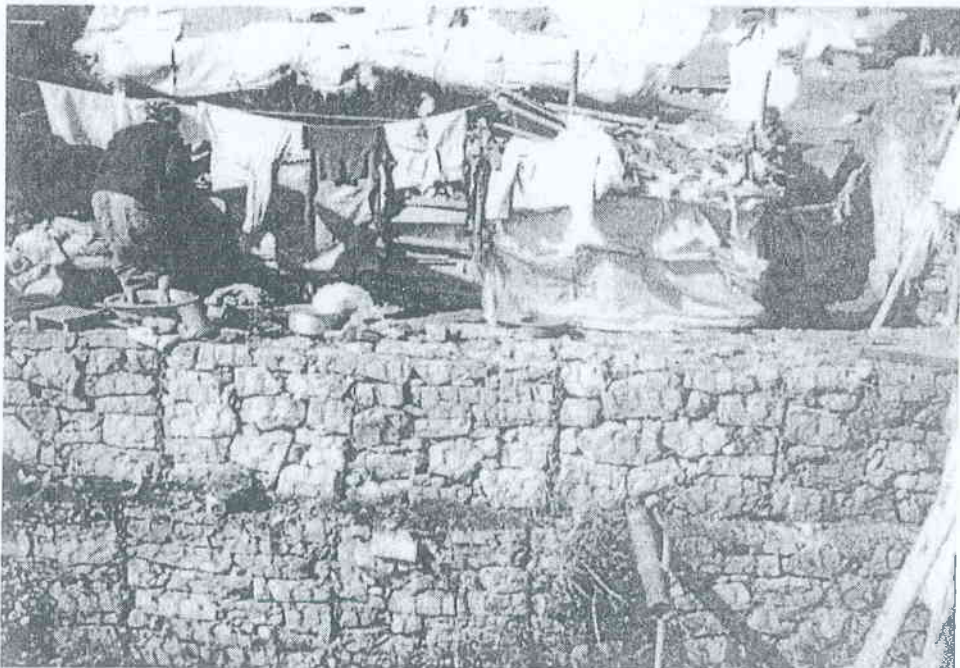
A temporary house of Shantinagar above the gabion wall
